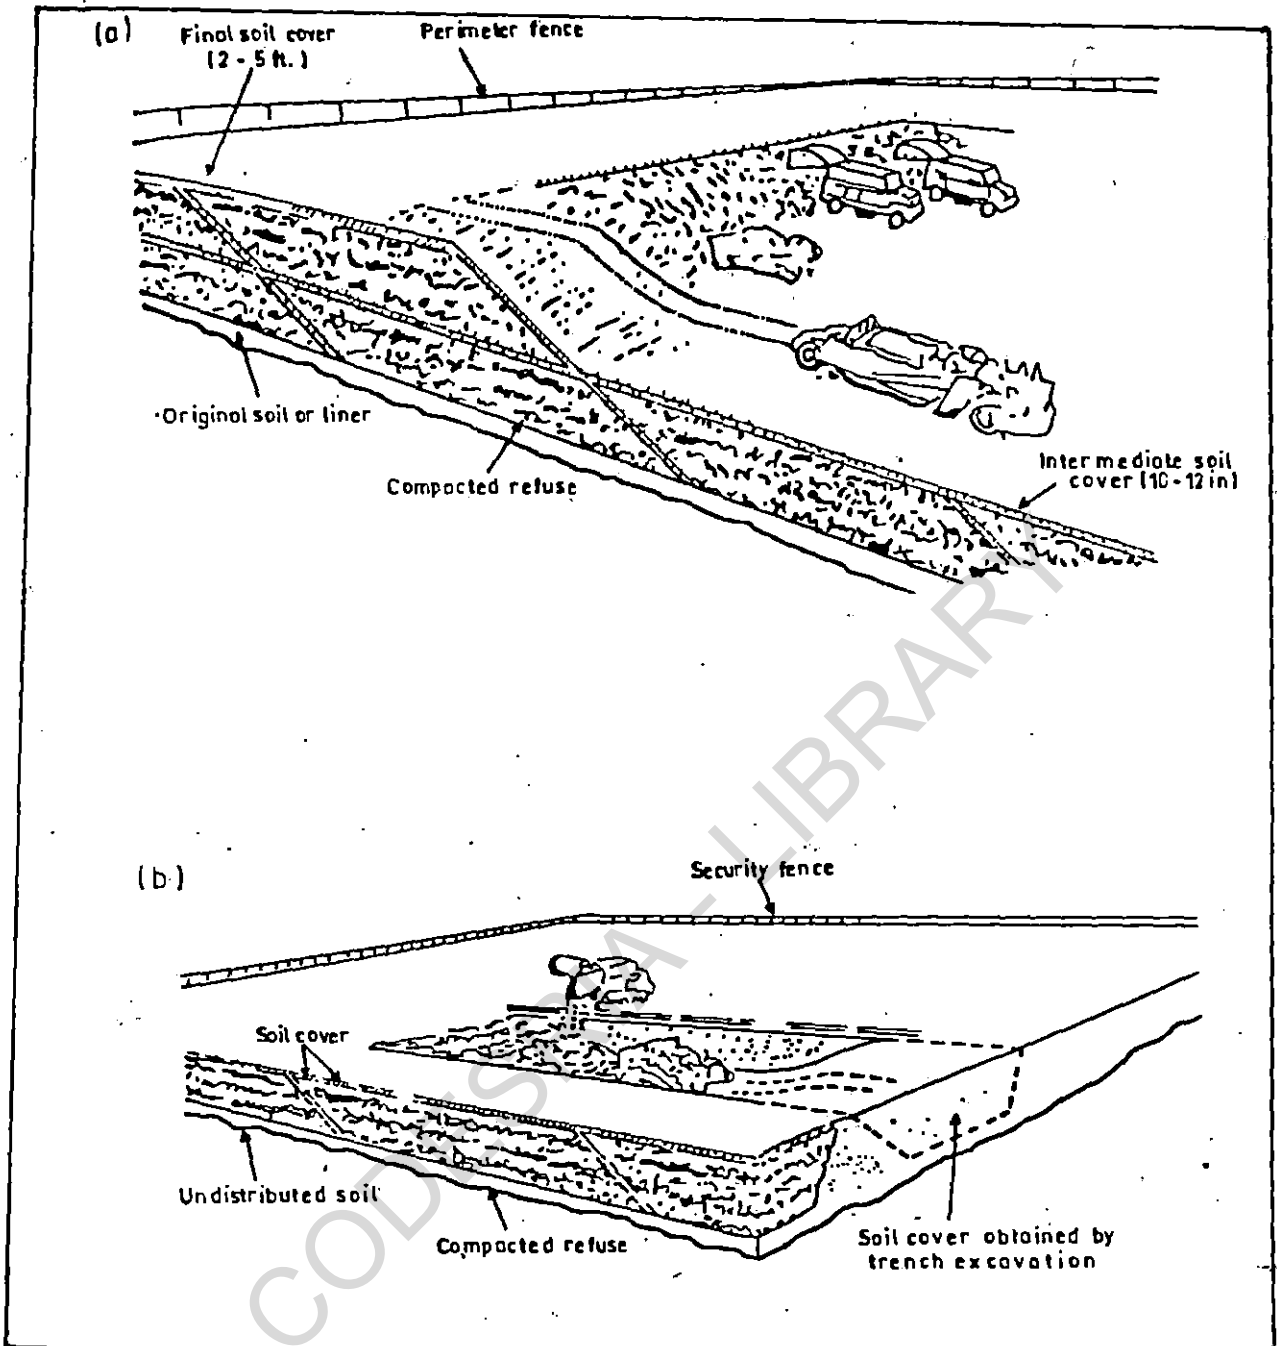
&b: Area and trench methods for placing solid waste in a sanitary landfill
